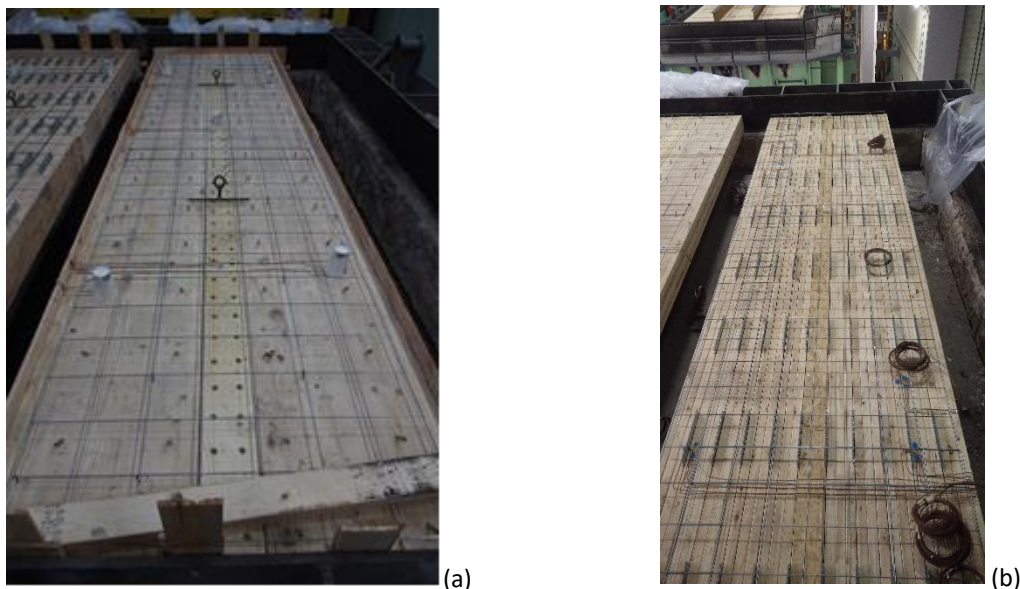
Construction of timber-concrete composite floors: (a) CLT-concrete composite floor, and (b) NLT-concrete composite floor
